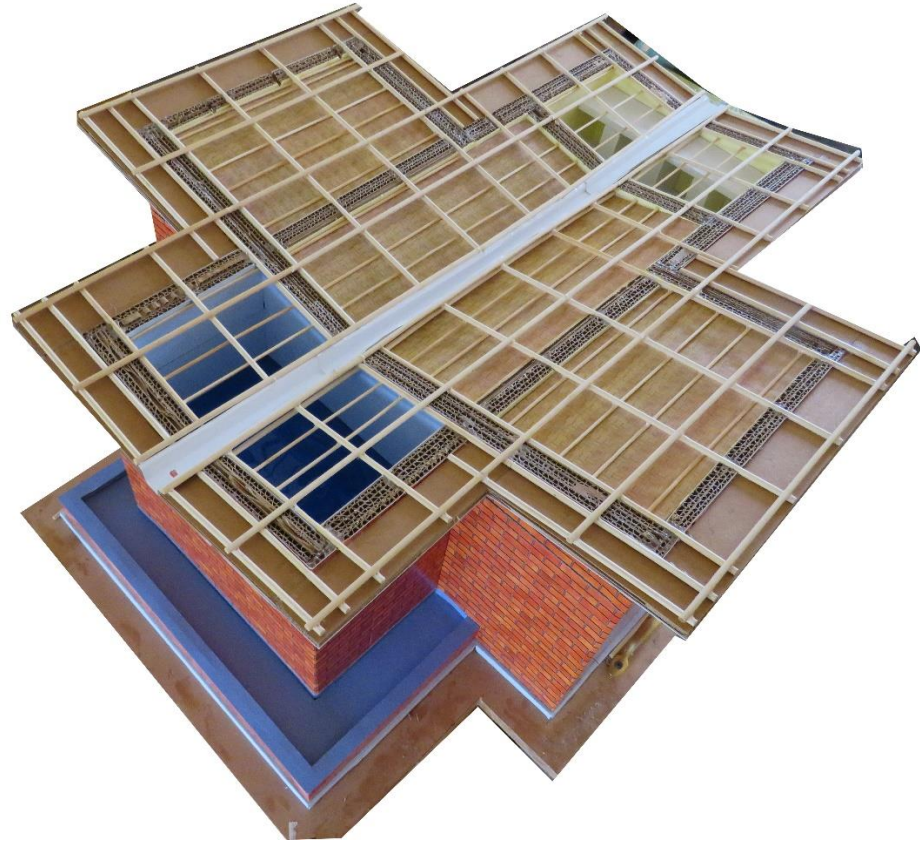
The roof structure and the drainage of the RBH
